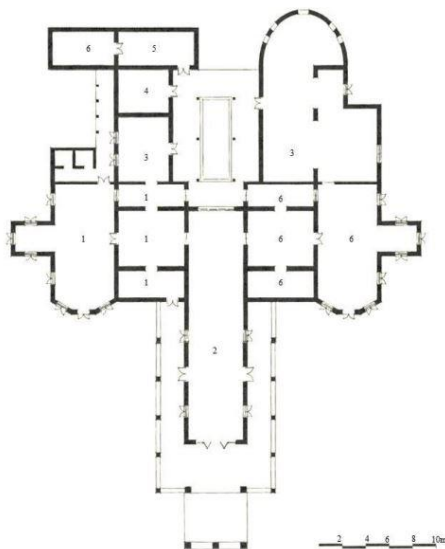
Plan of Manor – Certified School at Hikkaduwa [Drawing] (Source – By Author)
